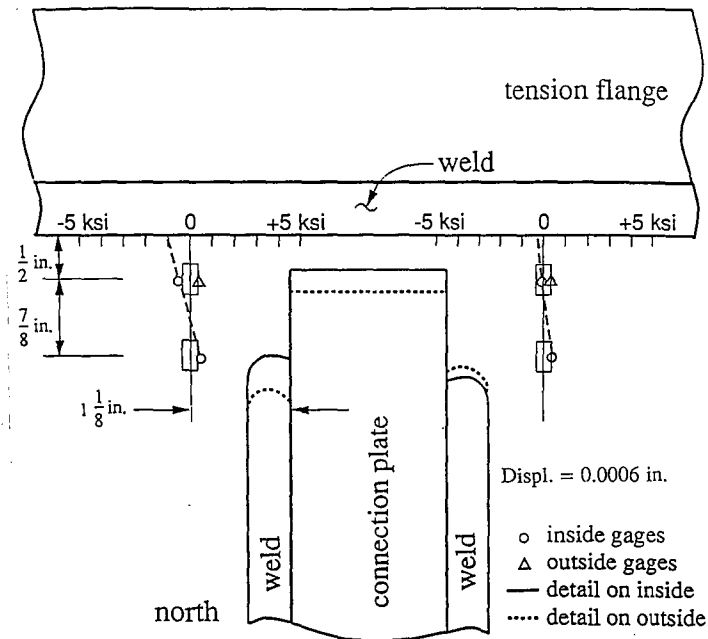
Static Stress Distribution on Inside Girder of Pier S7-9 (96 in Girder) After Retrofit with Dump Truck in Outside Lane (Worst Case)
